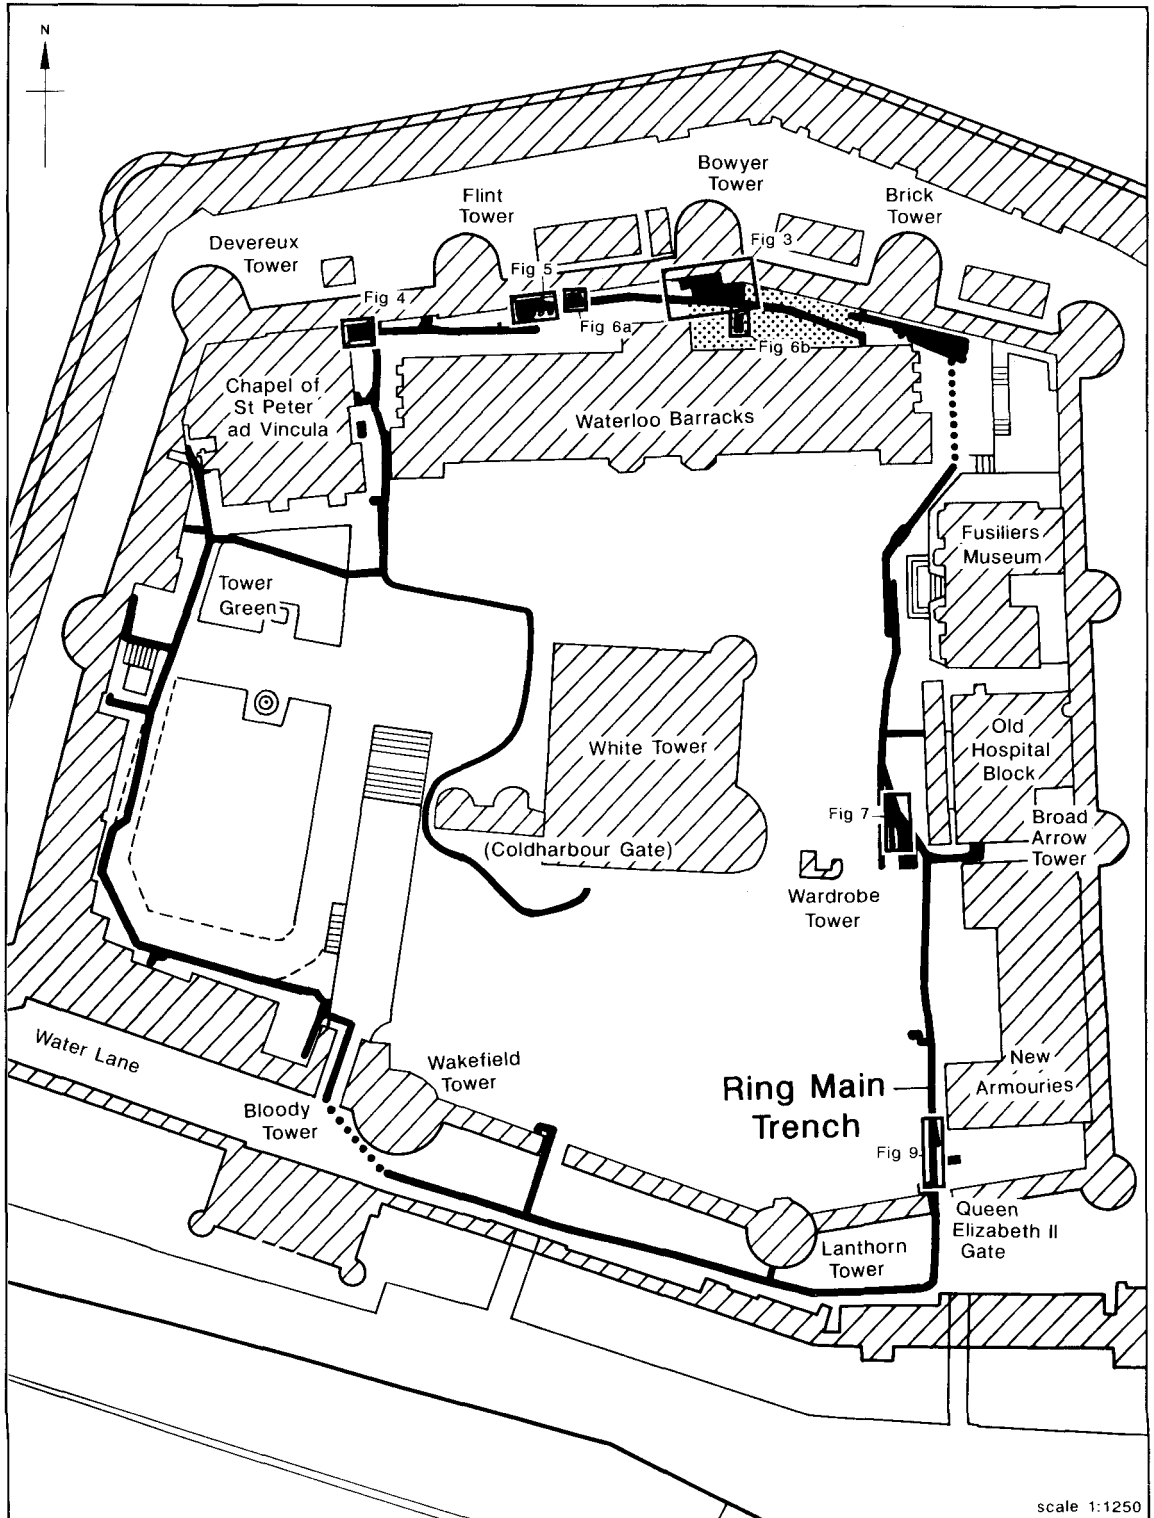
Tower of London: detailed location of the Crown Jewels Project, Inner Ring Main and White Tower cabling excavations
